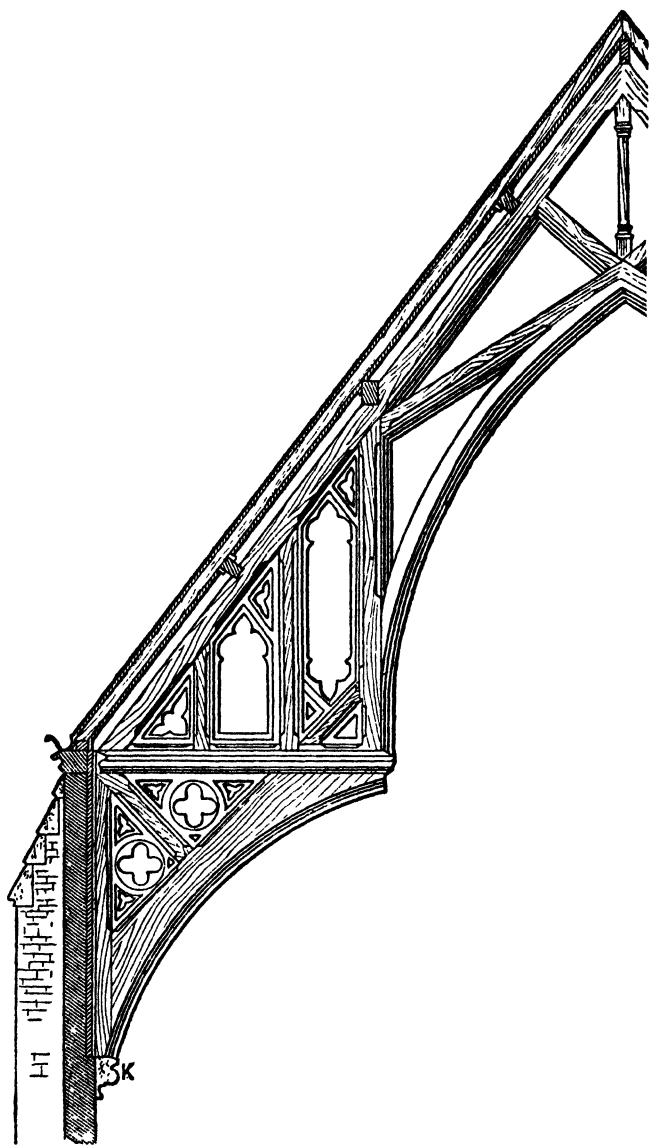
Modern Adaptation of Hammer-beam Roof-construction
